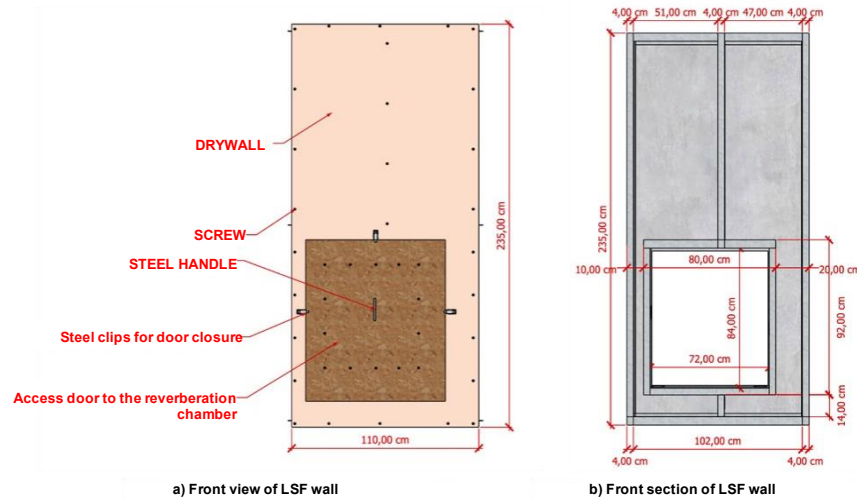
Front view schematic drawing of the test wall. a) frontal view; b) front cut.
